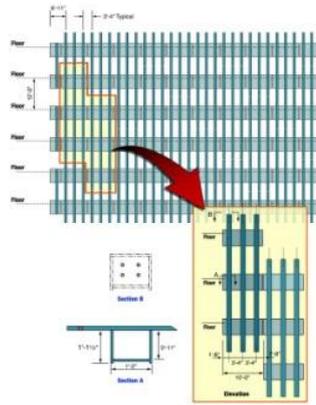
Detail section of exterior parapet wall frame showing exterior wall detail construction.
